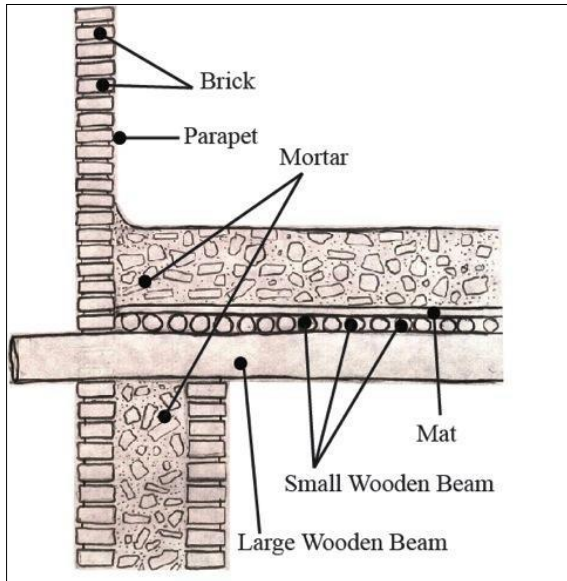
Detail (D-1), Section of a wooden timber ceiling construction technique using large and small beams, a burlap mat, and rubble (Abdulkareem, 2012)
